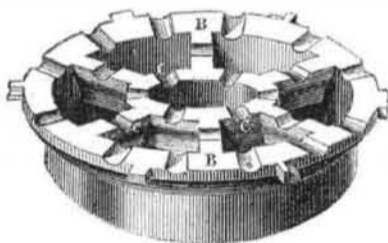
is a plan view of a section of Terry's cast-iron pavement, and fig. 2 a perspective view of a block of it. It is the invention of W. D. Terry, of Boston.
